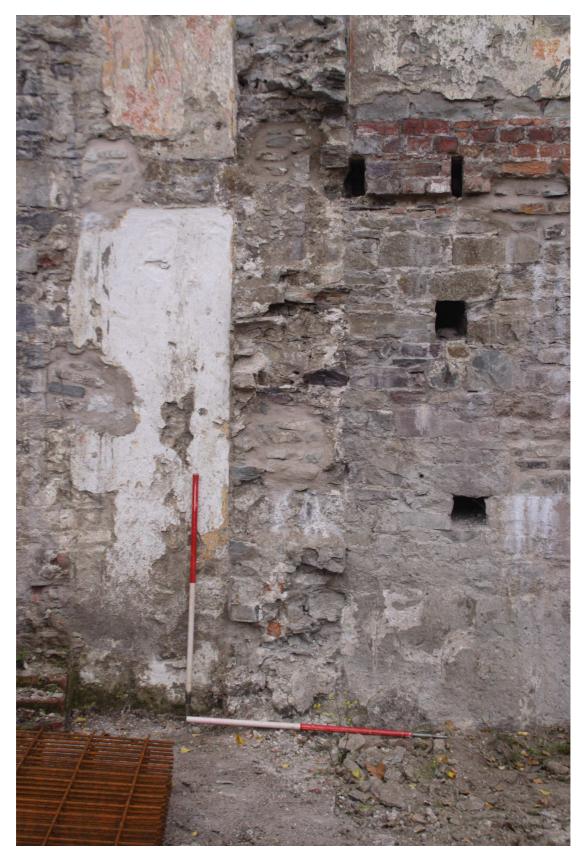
Lower section of retaining wall showing former gable end of cottage. Put logs visible to right along with floor joist slots of former cottage, shot 7.
